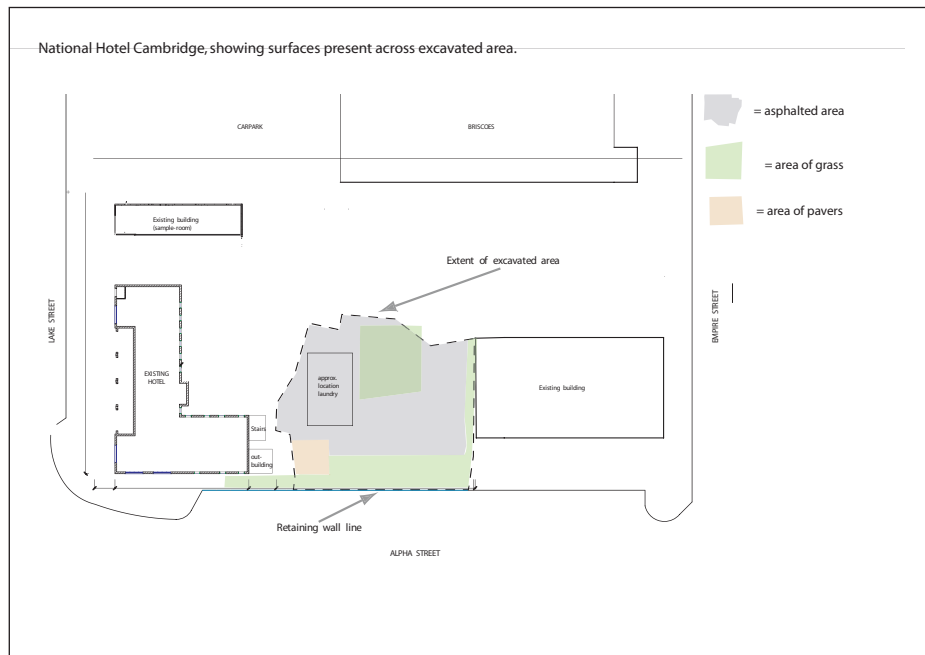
Situation of excavated area in relation to the hotel and other buildings on Allotment 389. The plan also identifies the different ground surfaces present prior to the excavation (asphalt, grass/lawn, pavers).
